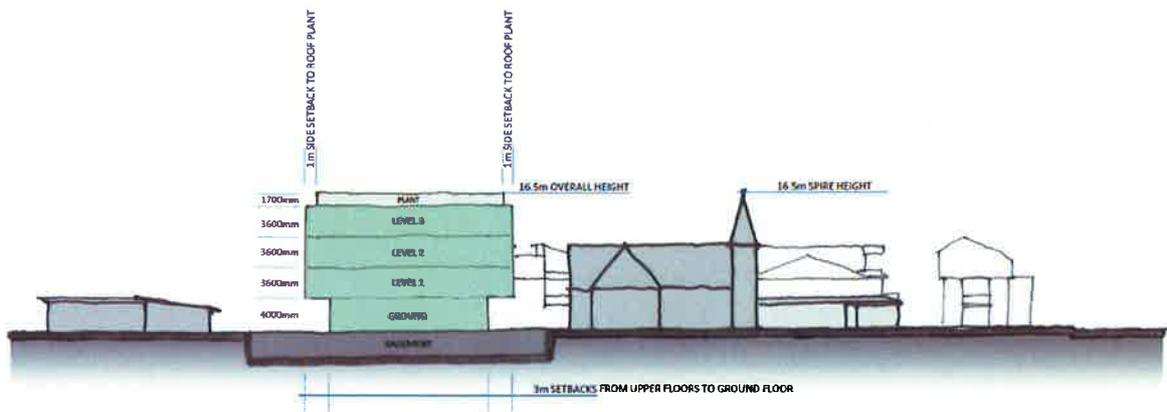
Indicative concept of the interface between the building envelope and St Matthew's Church) (Source: Planning Proposal & BuiltConsult Pty Ltd)
